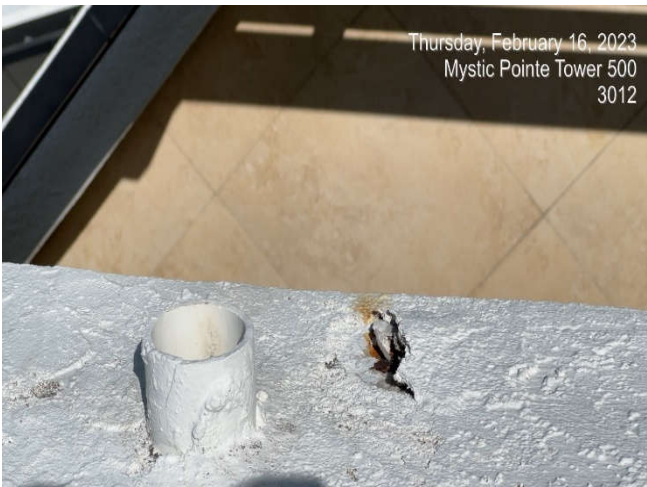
b.15 – Rust spot at balcony knee wall (Unit 3012)
